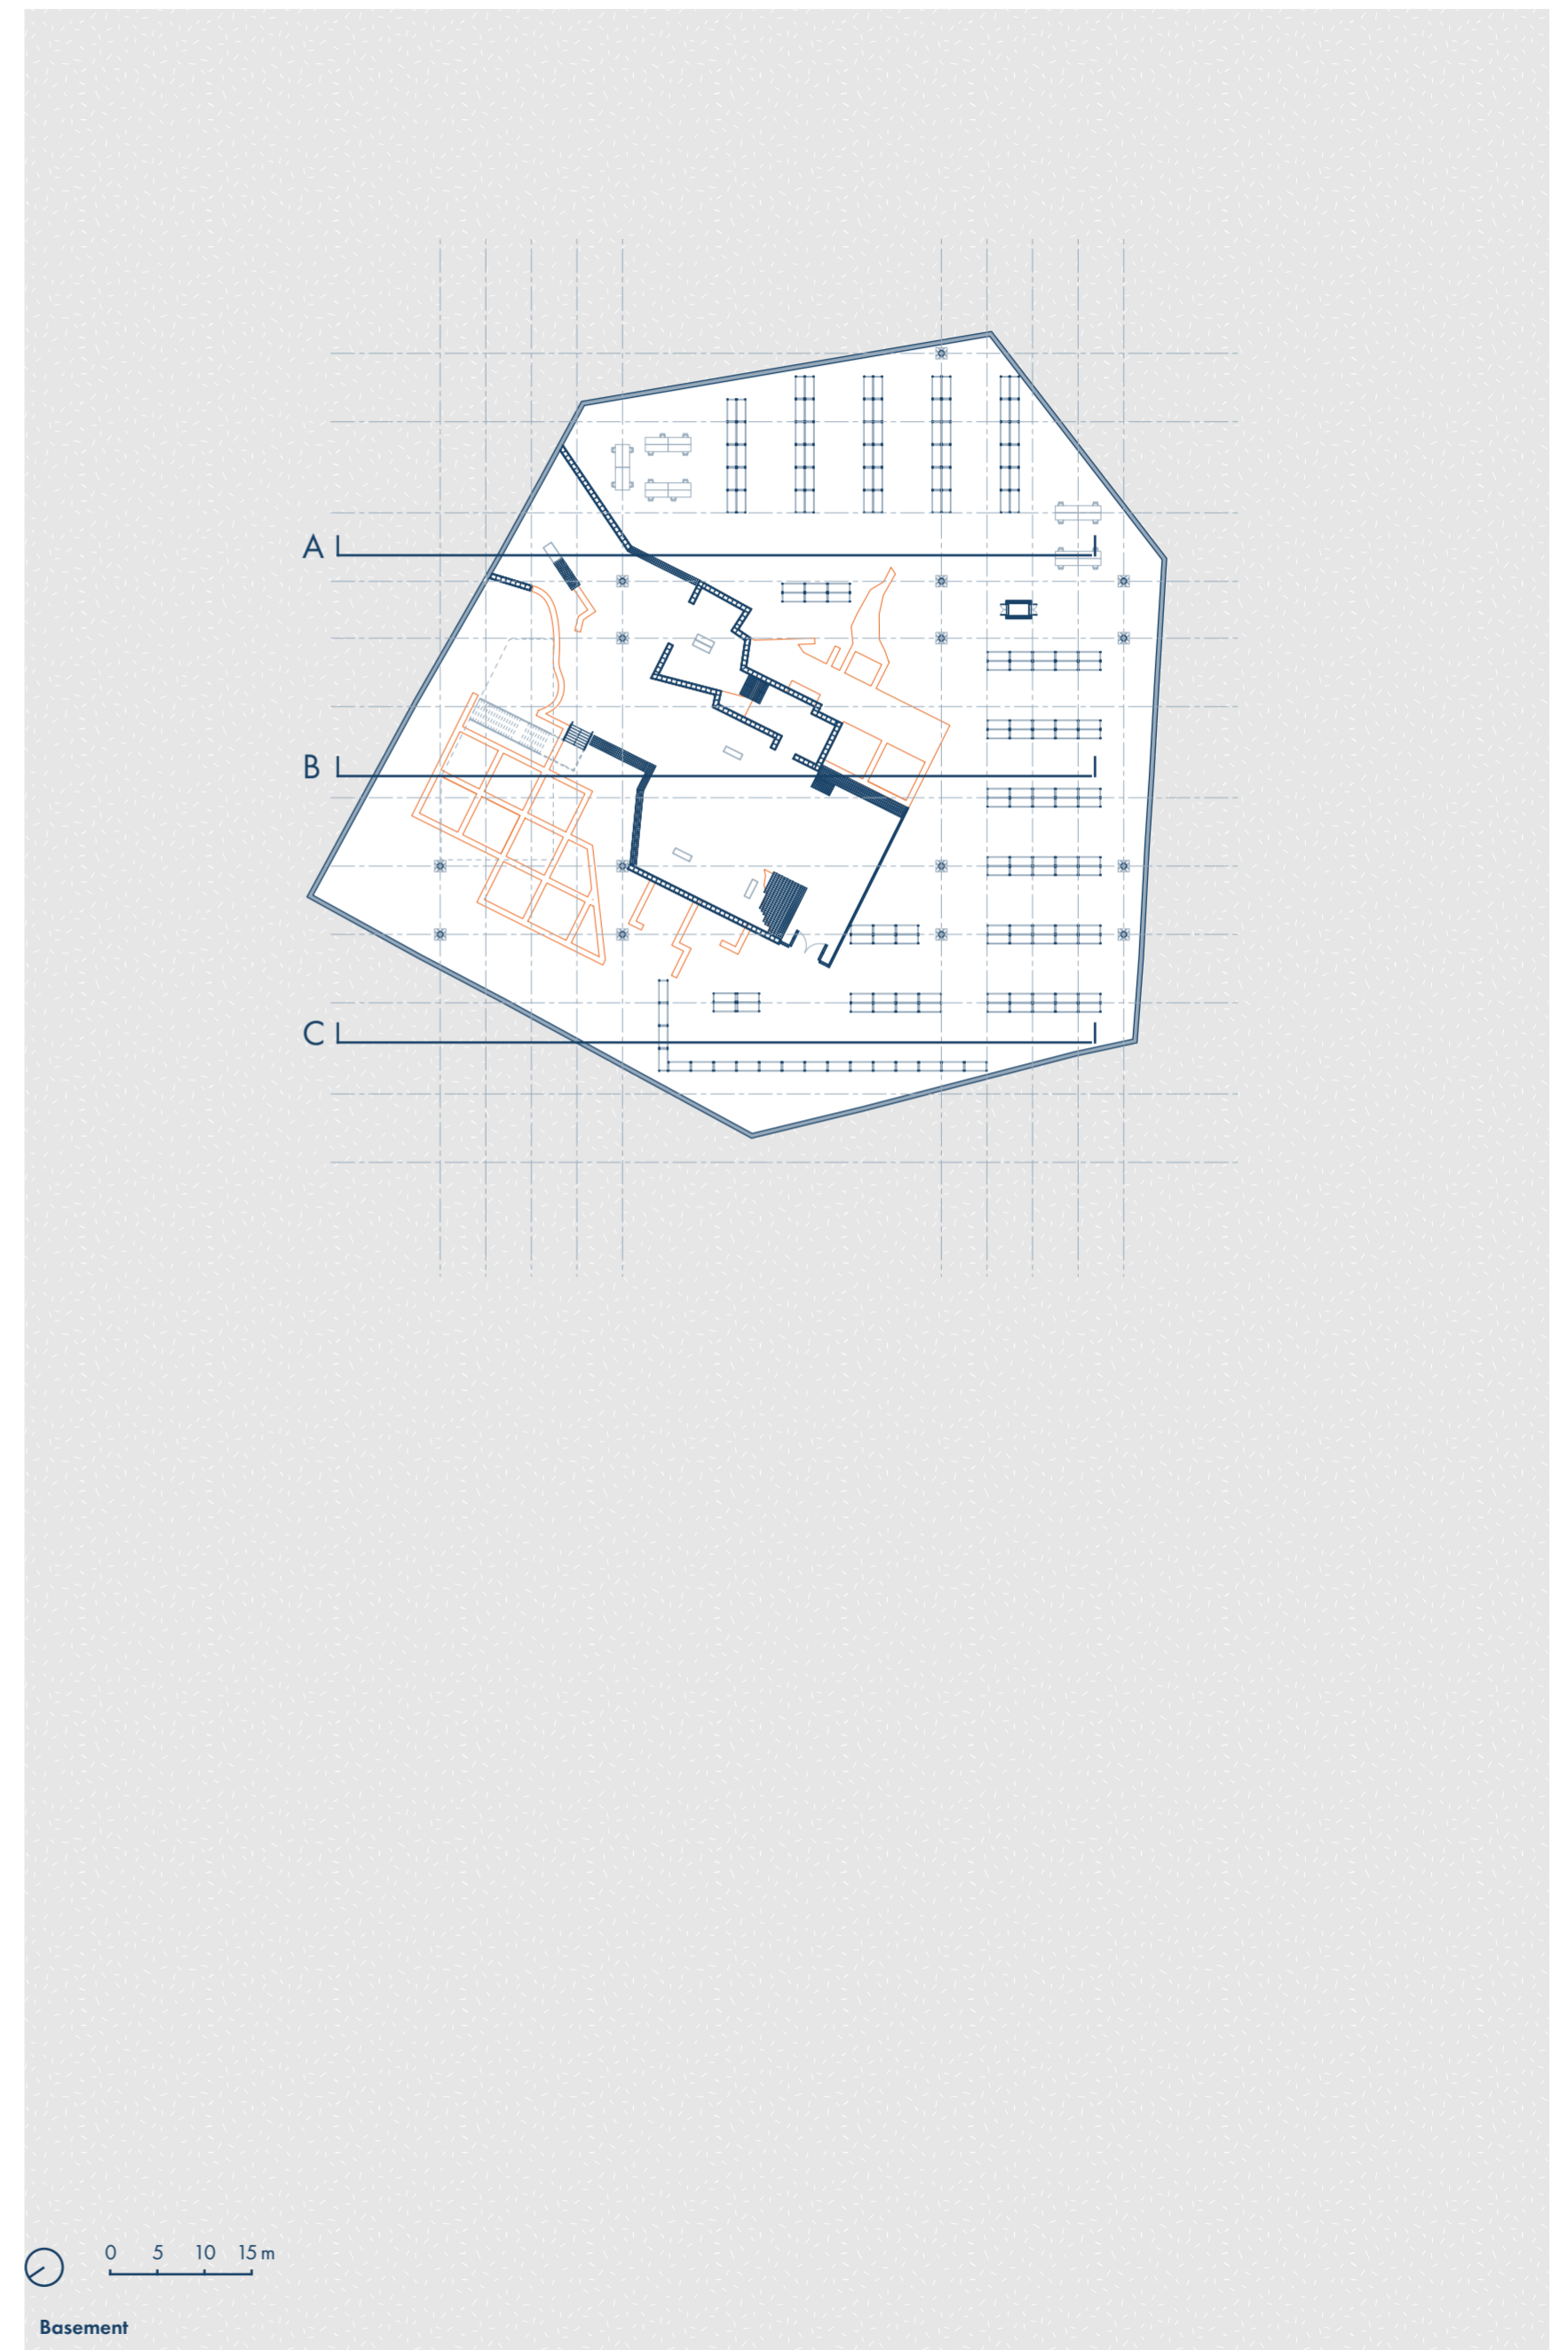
Finalized institutional Basement floor plan. (Drawing by author, 2026).
